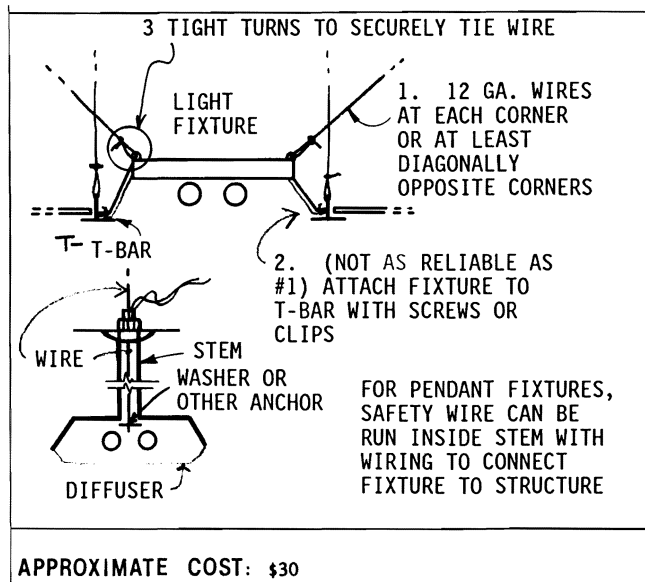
Hanging light fixtures can be made safer with additional wires or anchoring to keep them from swaying and with reinforced suspension to keep them from falling.
